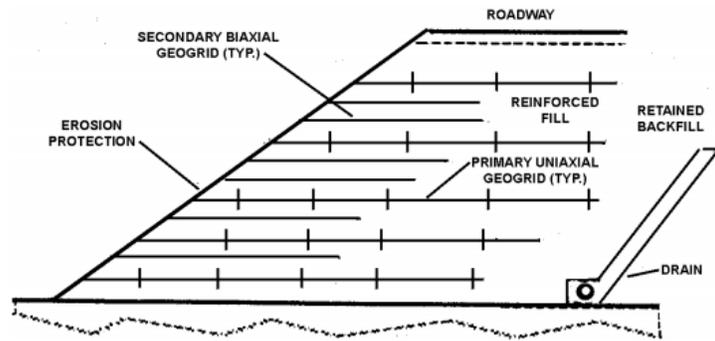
Material and structural components of a typical, reinforced steepened slope. Source: Gray & Sotir (1995)
